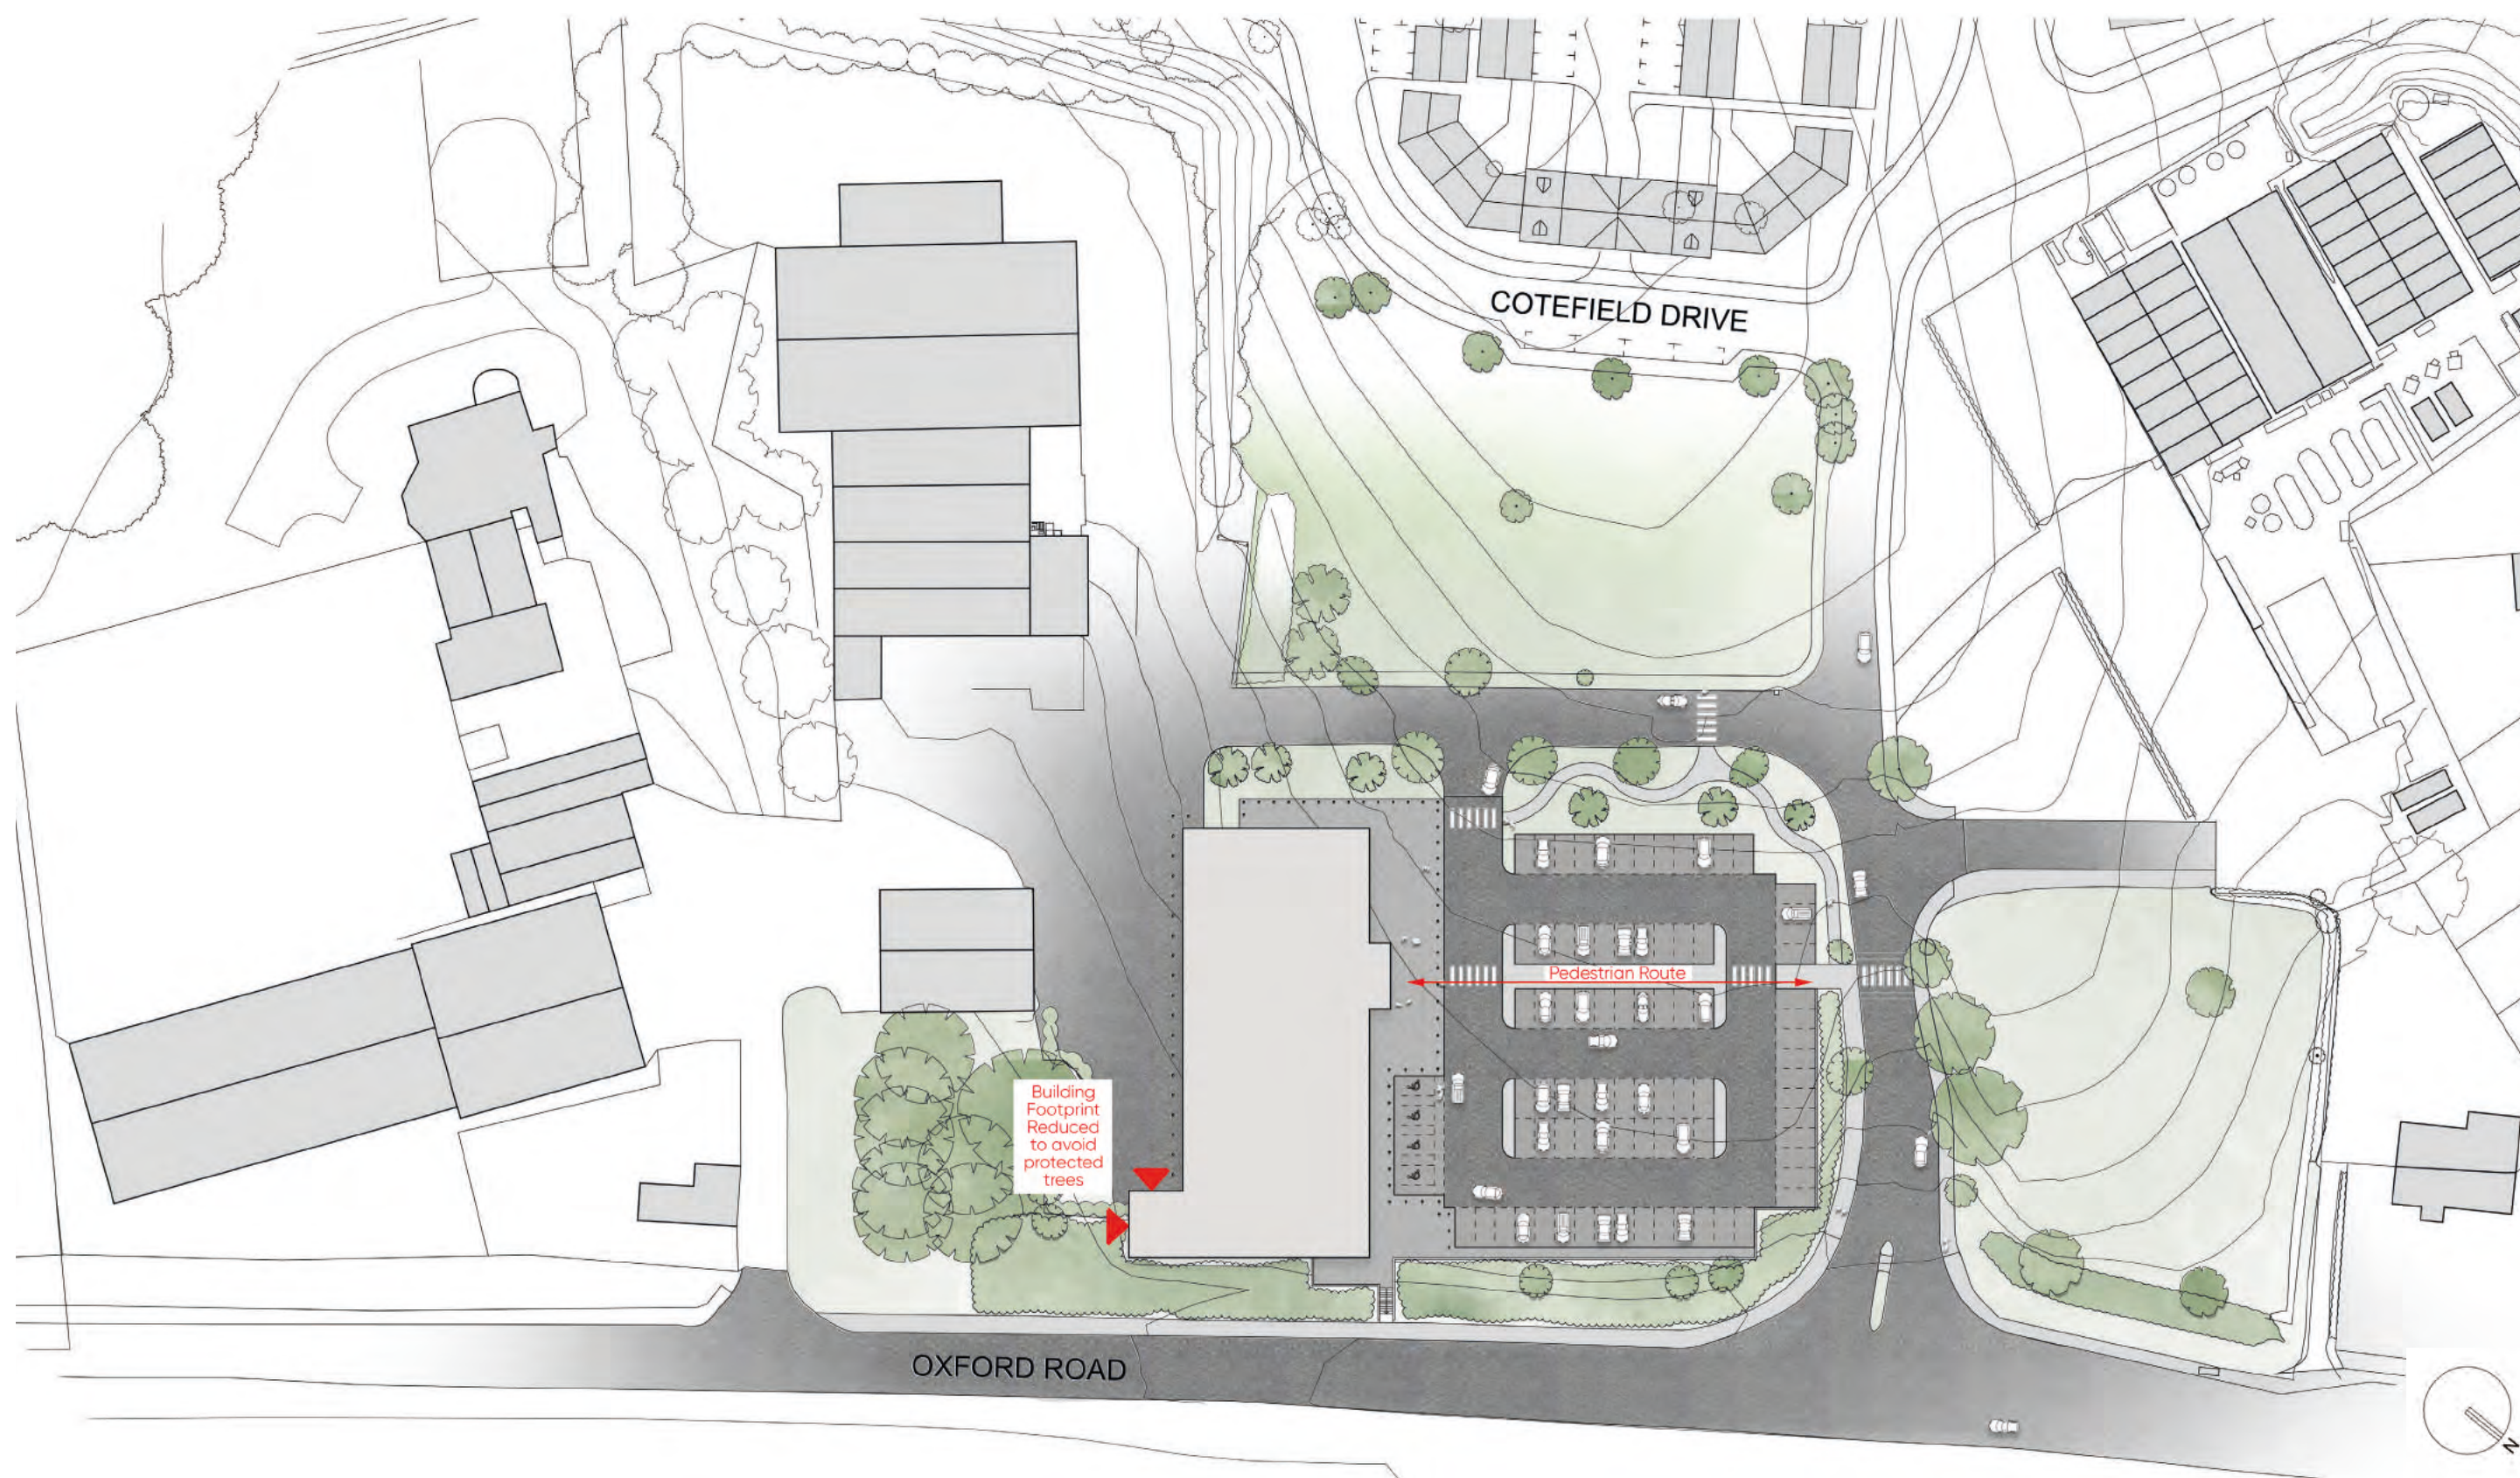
Figure J - Developed Layout showing Reduced Building Footprint at rear and pedestrian access
